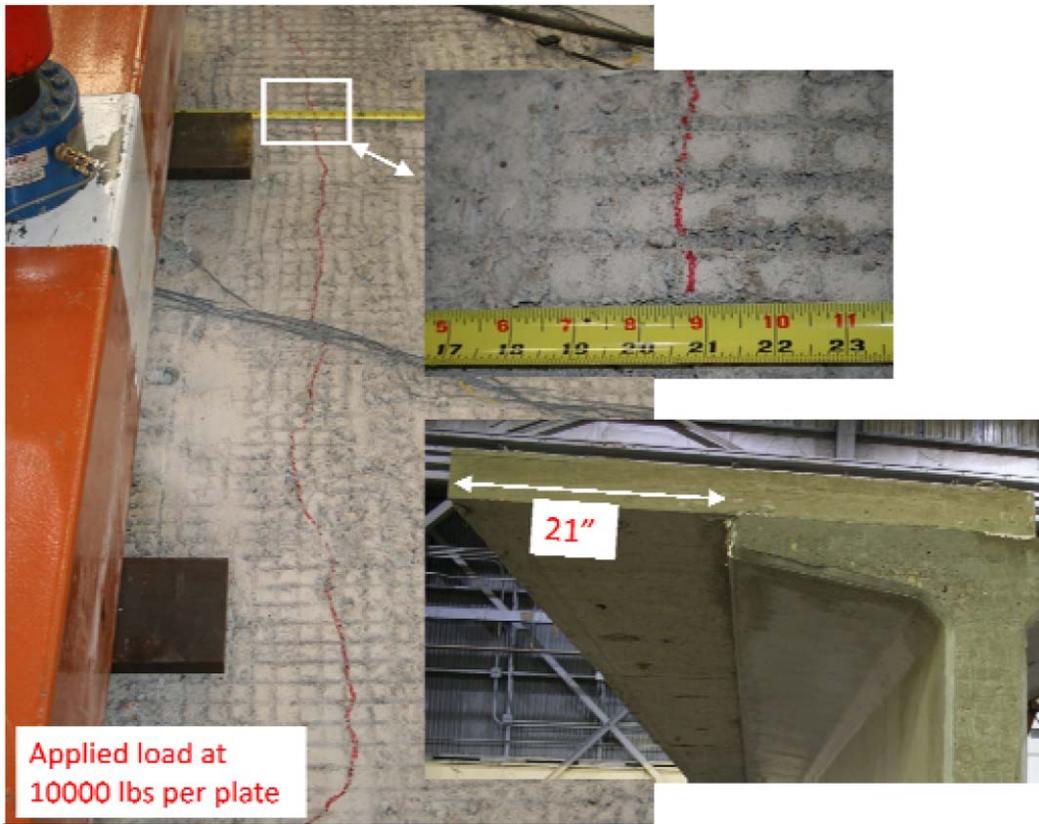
Crack at intersection of overhang and top flange
